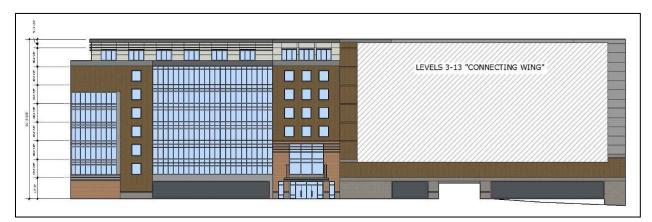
R&D/office (Buildings C1 and C2), Rendered Front Exterior Elevation
